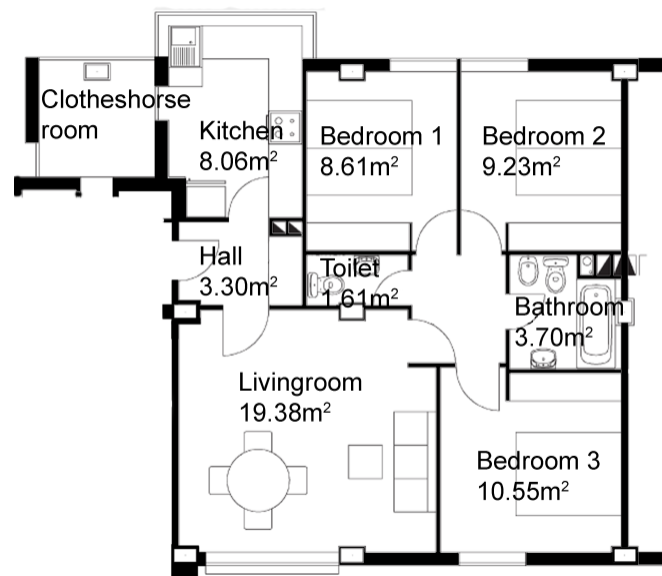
Floor plan of dwellings in the housing block. Dwelling useful floor area: 67.53 m²
